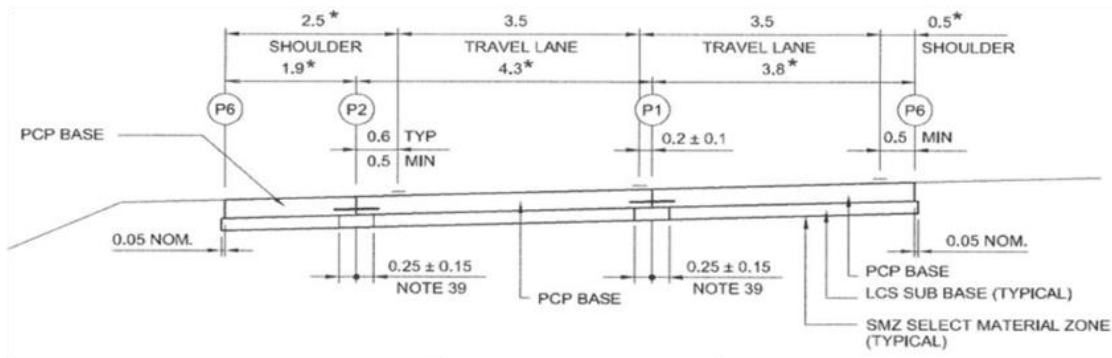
(a) 2-lane 10m carriageway (NSW) showing concrete shoulder and widened truck lane detail with shoulder longitudinal joint offset from edgeline marking
